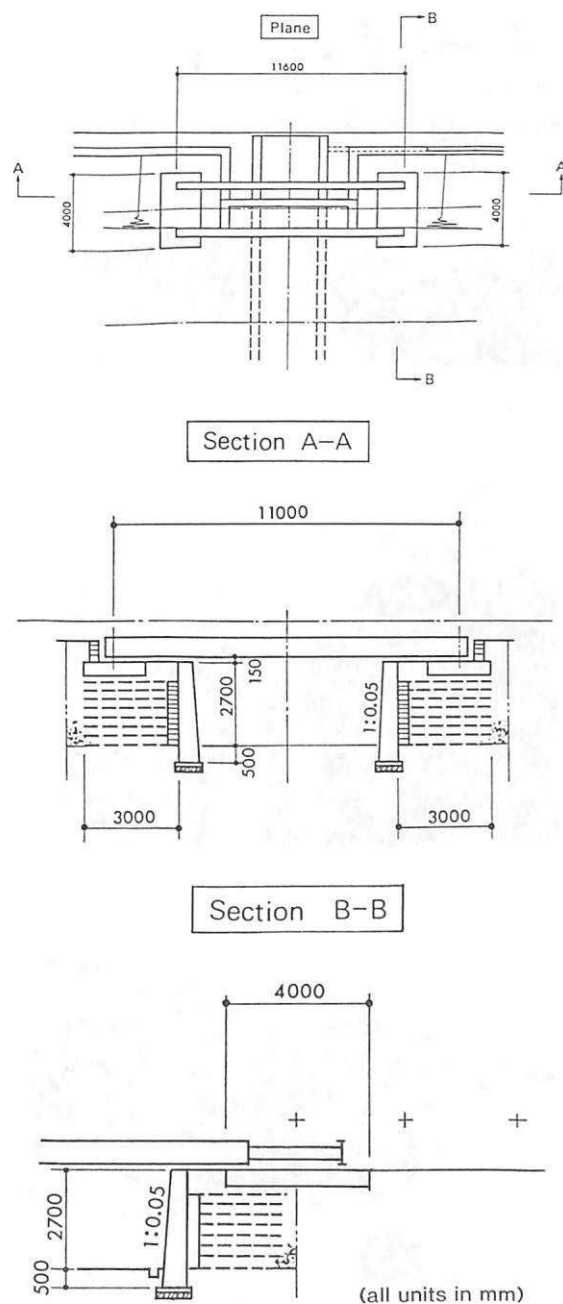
Plans and cross-sections of GRS-RW bridge abutments at Takeshima BV (No.1 in Fig. 3)
